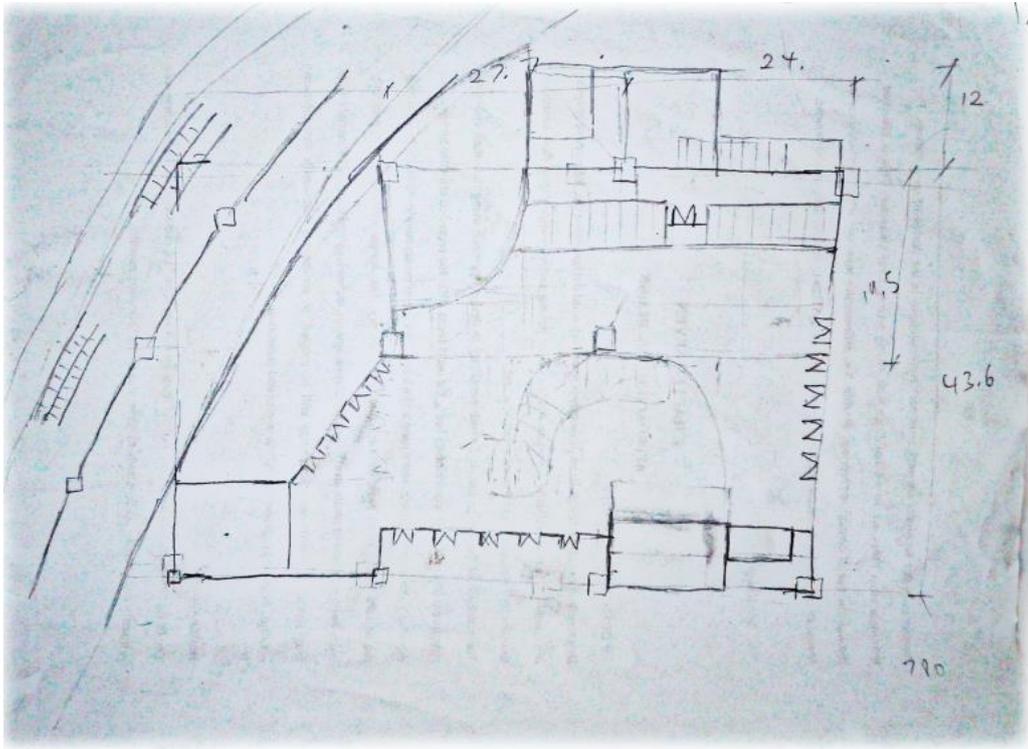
1: Initial hand sketch of proposed ground floor plan
